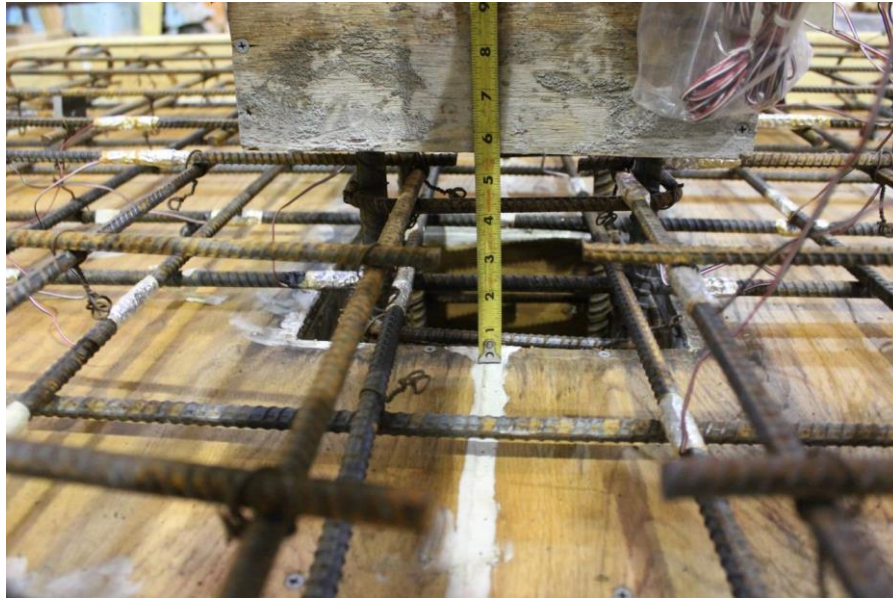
Picture of formwork with rebar placed and top column form in place
